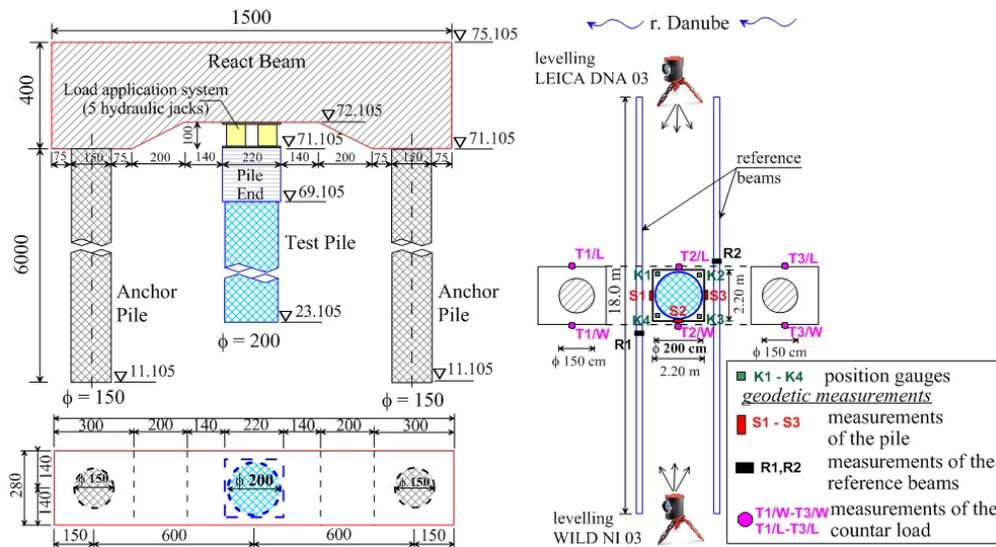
Static load test structure with location of gauges and points of geodetic observation
